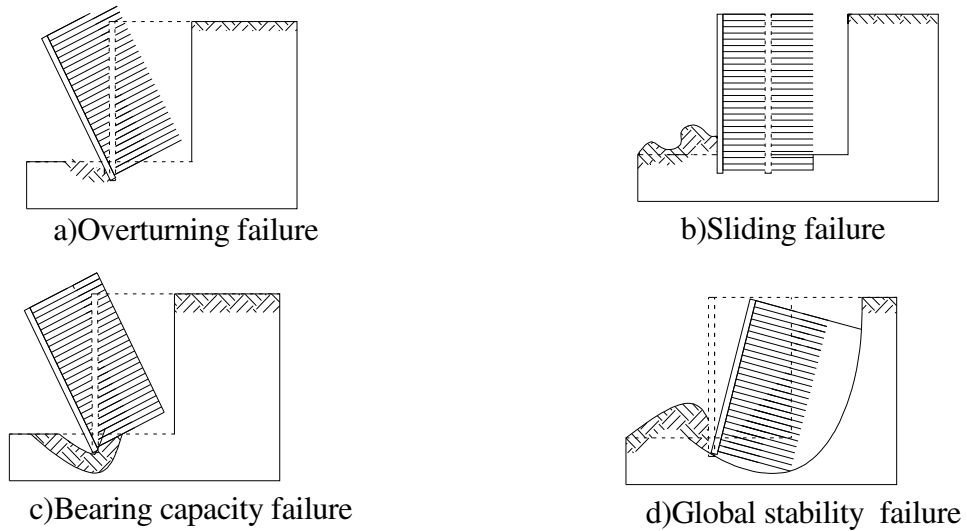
Potential failure mechanisms for external stability of reinforced earth retaining wall.
